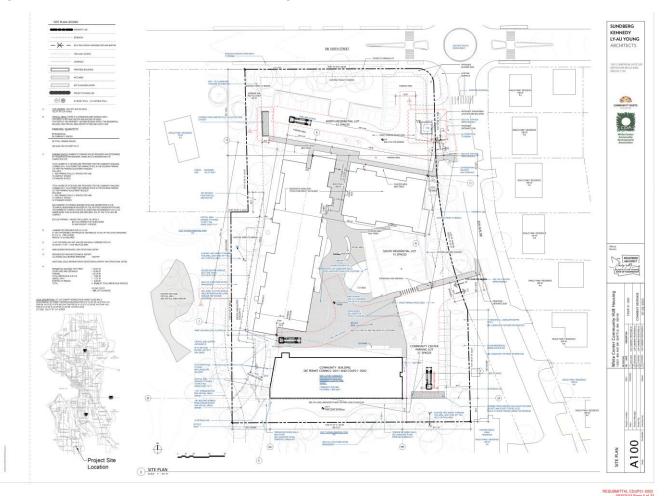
B Reduced CUP site Plan Sheet A100, Received August 30, 2023
